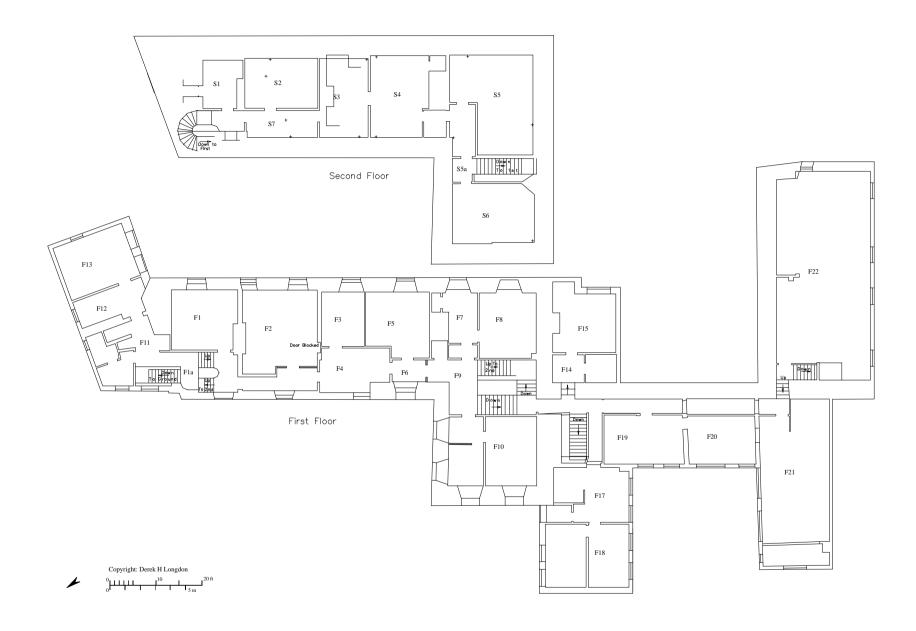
Abbey Gate: first and second floor plans, showing room numbering.
